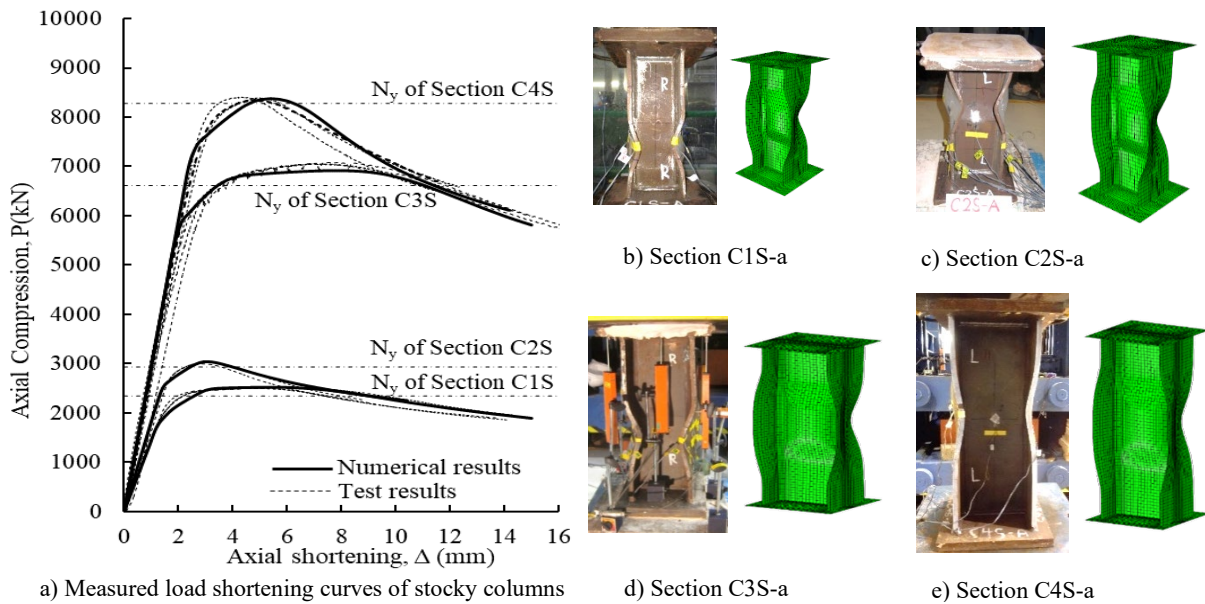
Measured load-shortening curves and typical failure modes of S690 stocky columns
